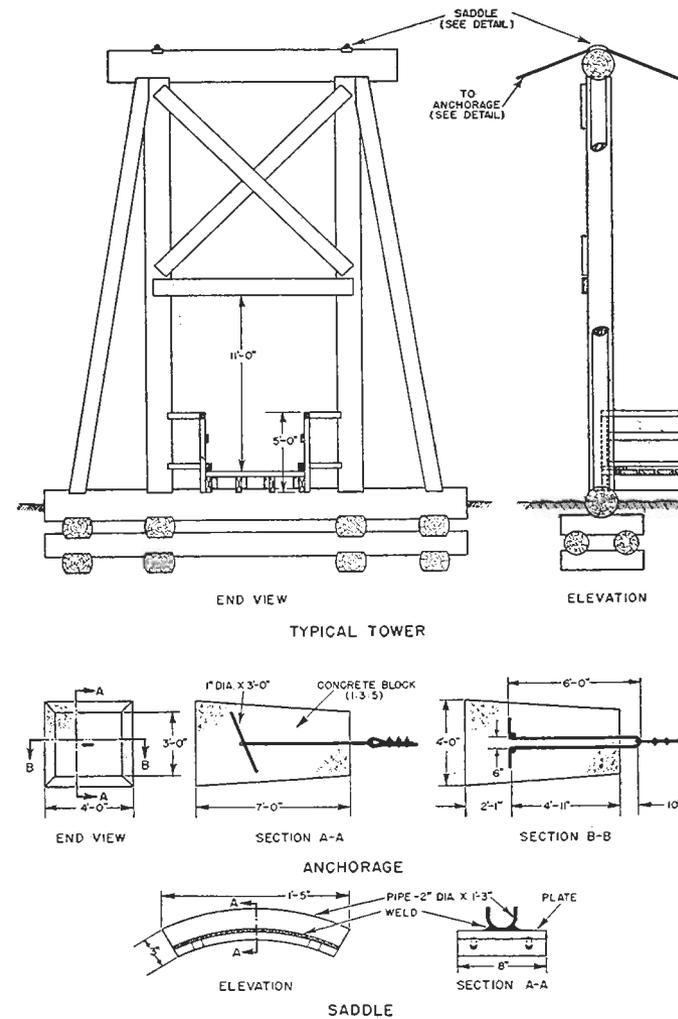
Pack-train suspension bridge. Tower and anchorage.
